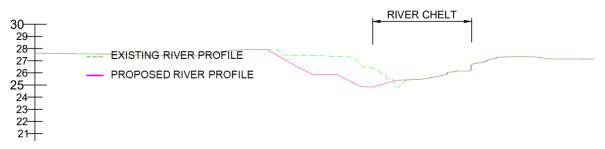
Cross-section of riverbank reprofiling proposed in Scheme design
